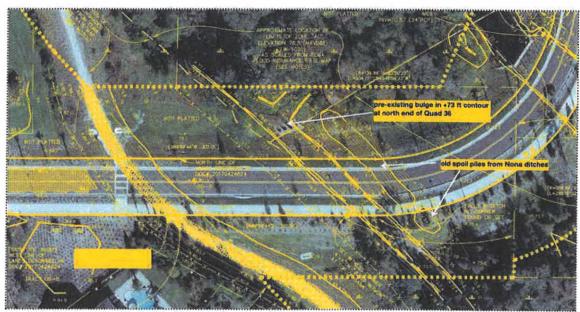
Pre-construction topo at Quad 36, note channel instability on north
